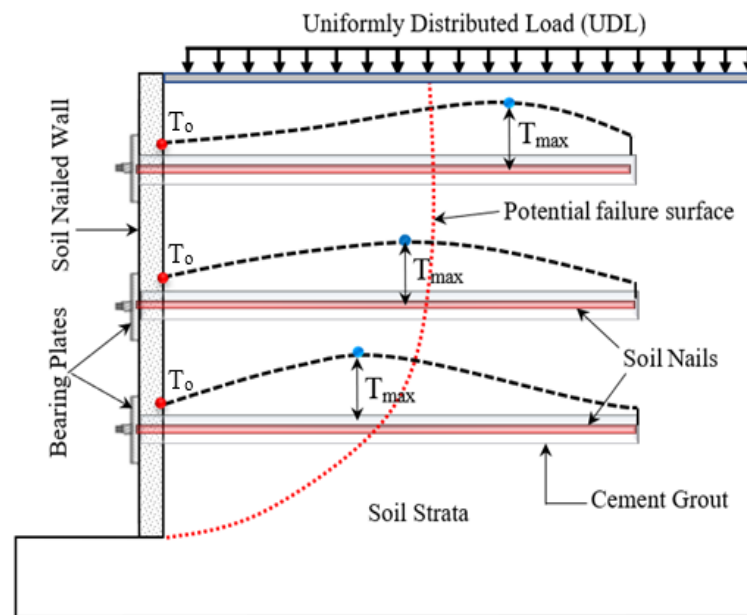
Location of maximum tensile force in soil nail wall structure (Lazarte et al., 2003).
